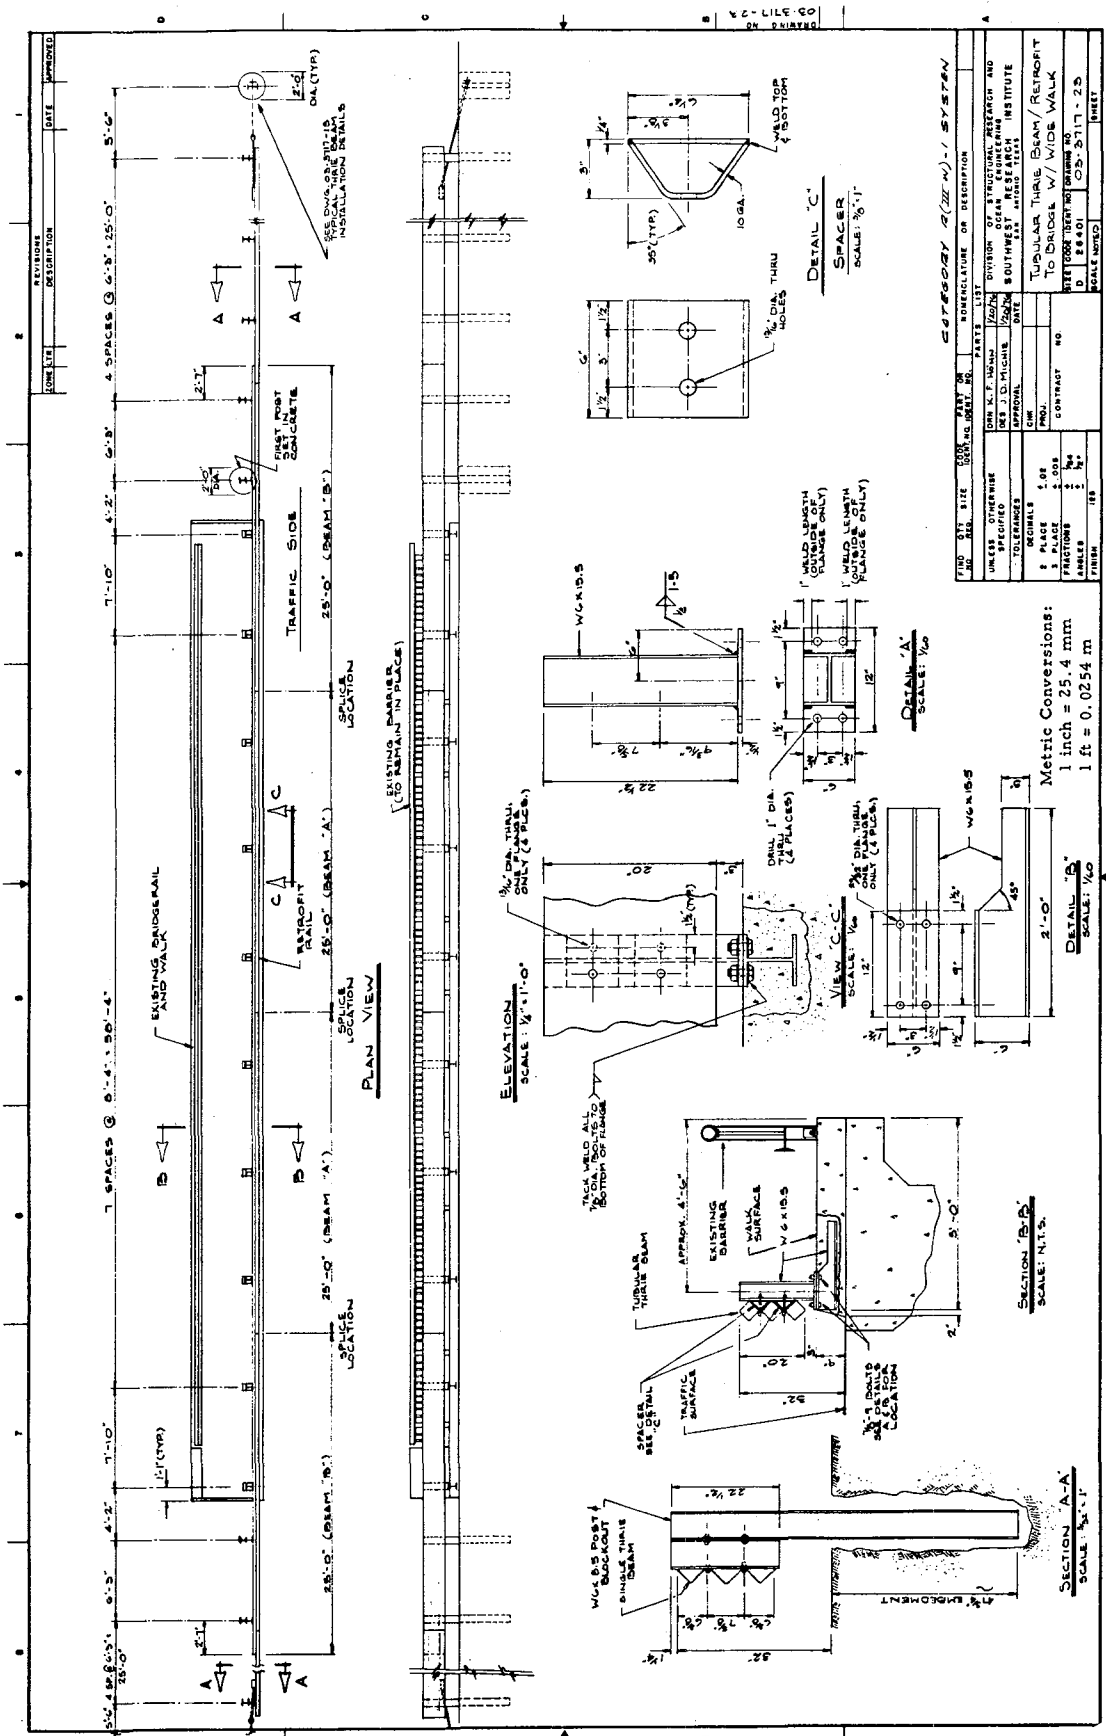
CATEGORY R(IIW)-1 INSTALLATION DRAWING
